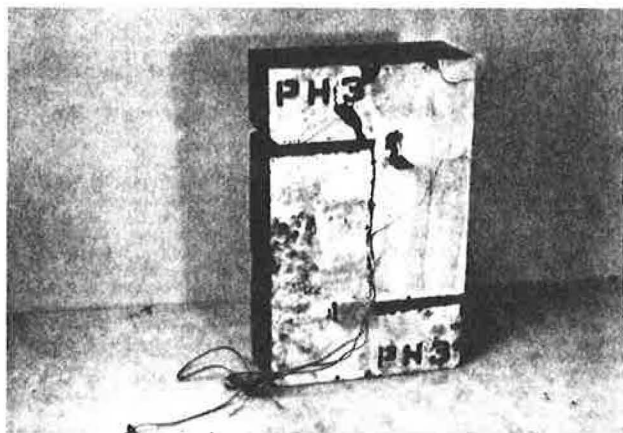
Typical failure of PM and PH specimens (spalling of magnesium phosphate concrete).
